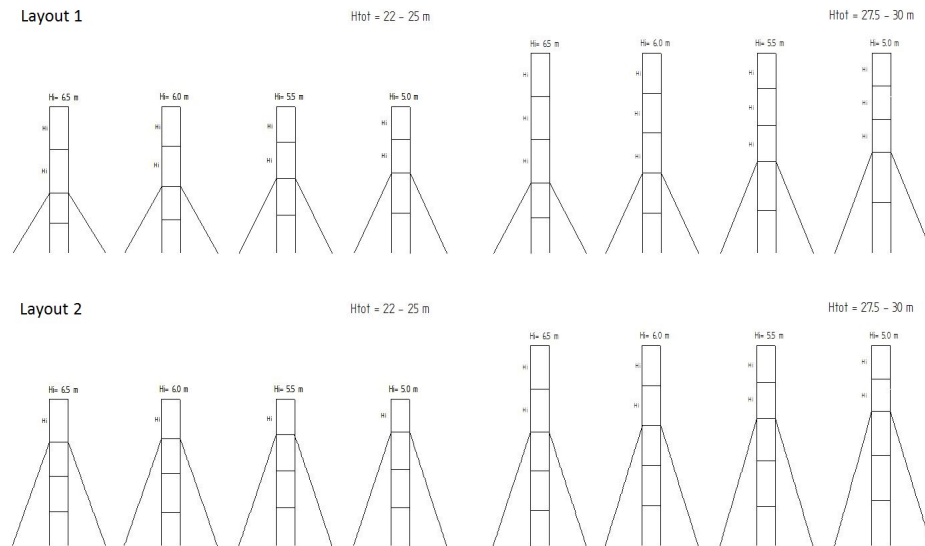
Layout solutions - 1 (short external bracings) and 2 (long external bracings)
